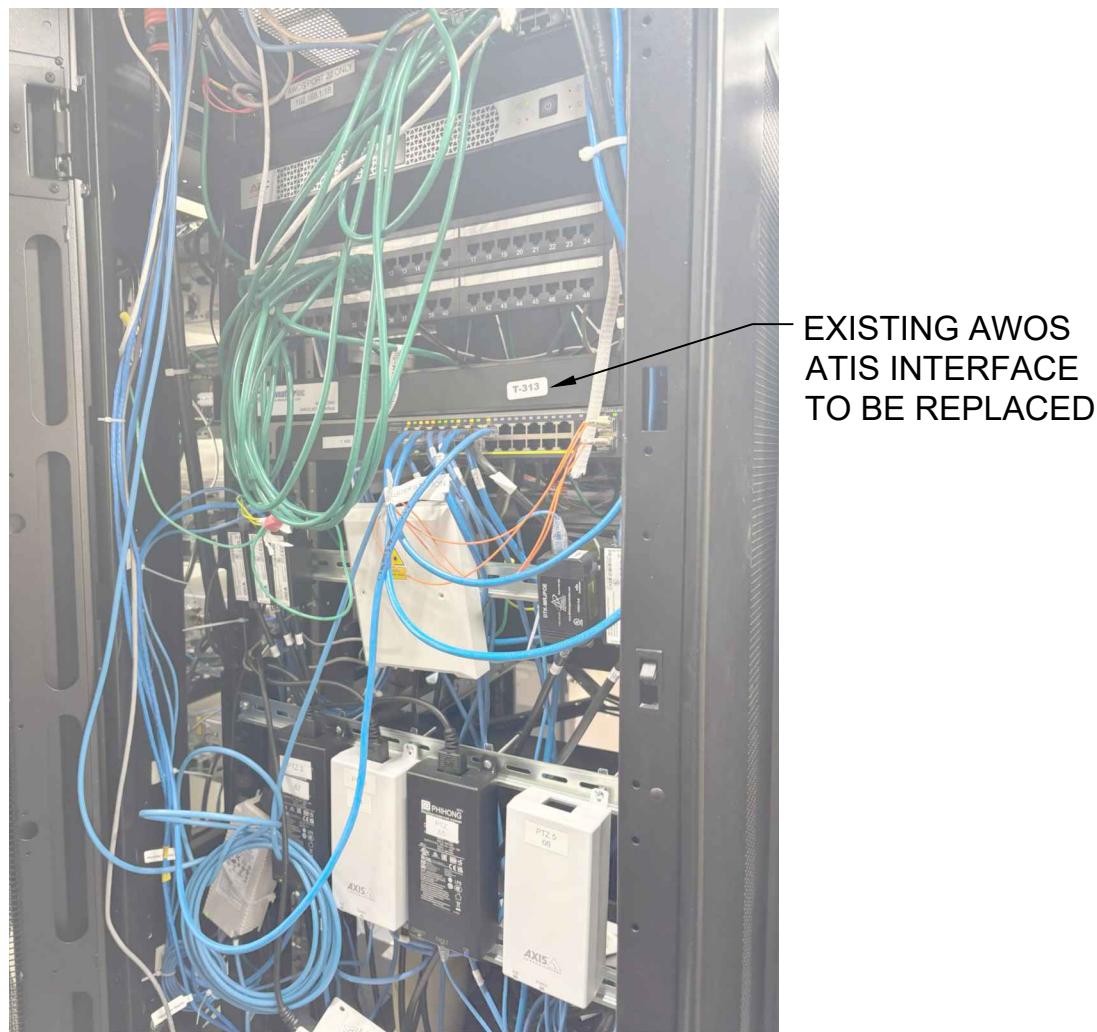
2ND LEVEL EQUIPMENT ROOM
